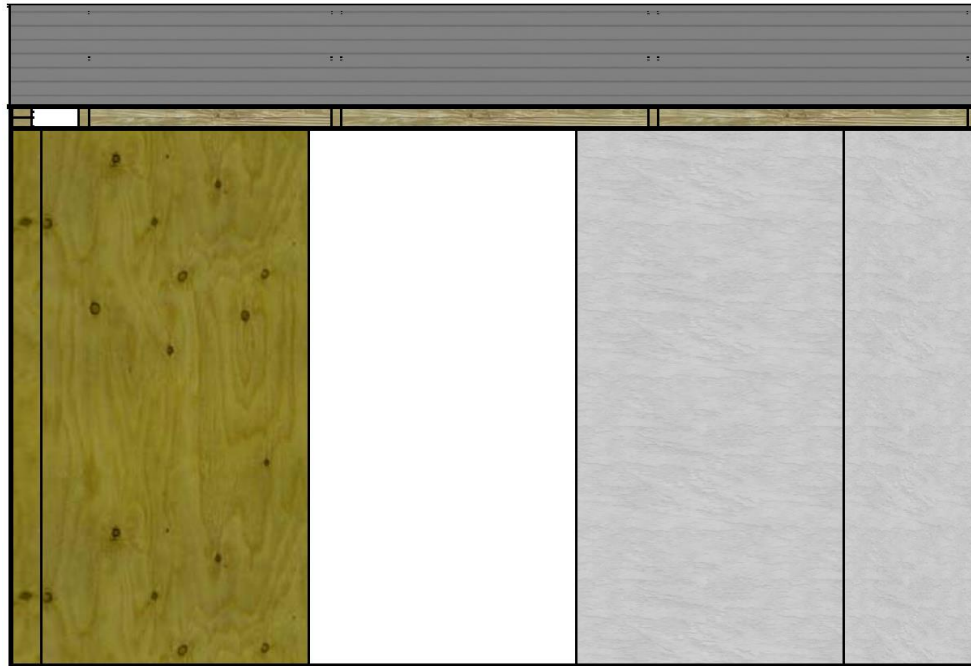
Non-rated long wall cladding systems, from left to right: plywood, plasterboard, fibre cement
